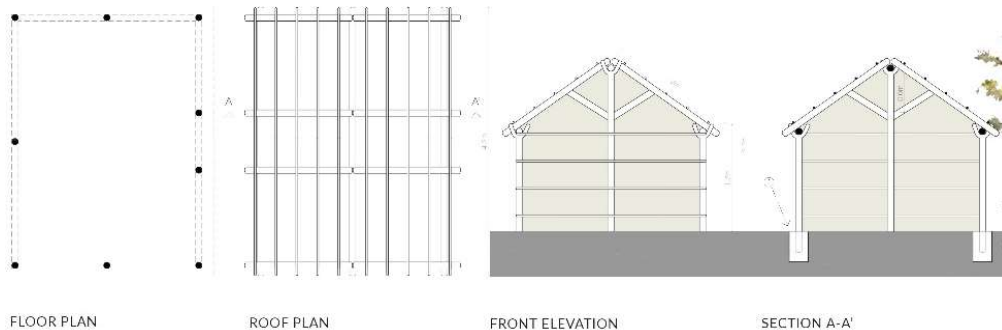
, Wooden Gable frame shelter, in south sudan, (UNHCR, 2016)
